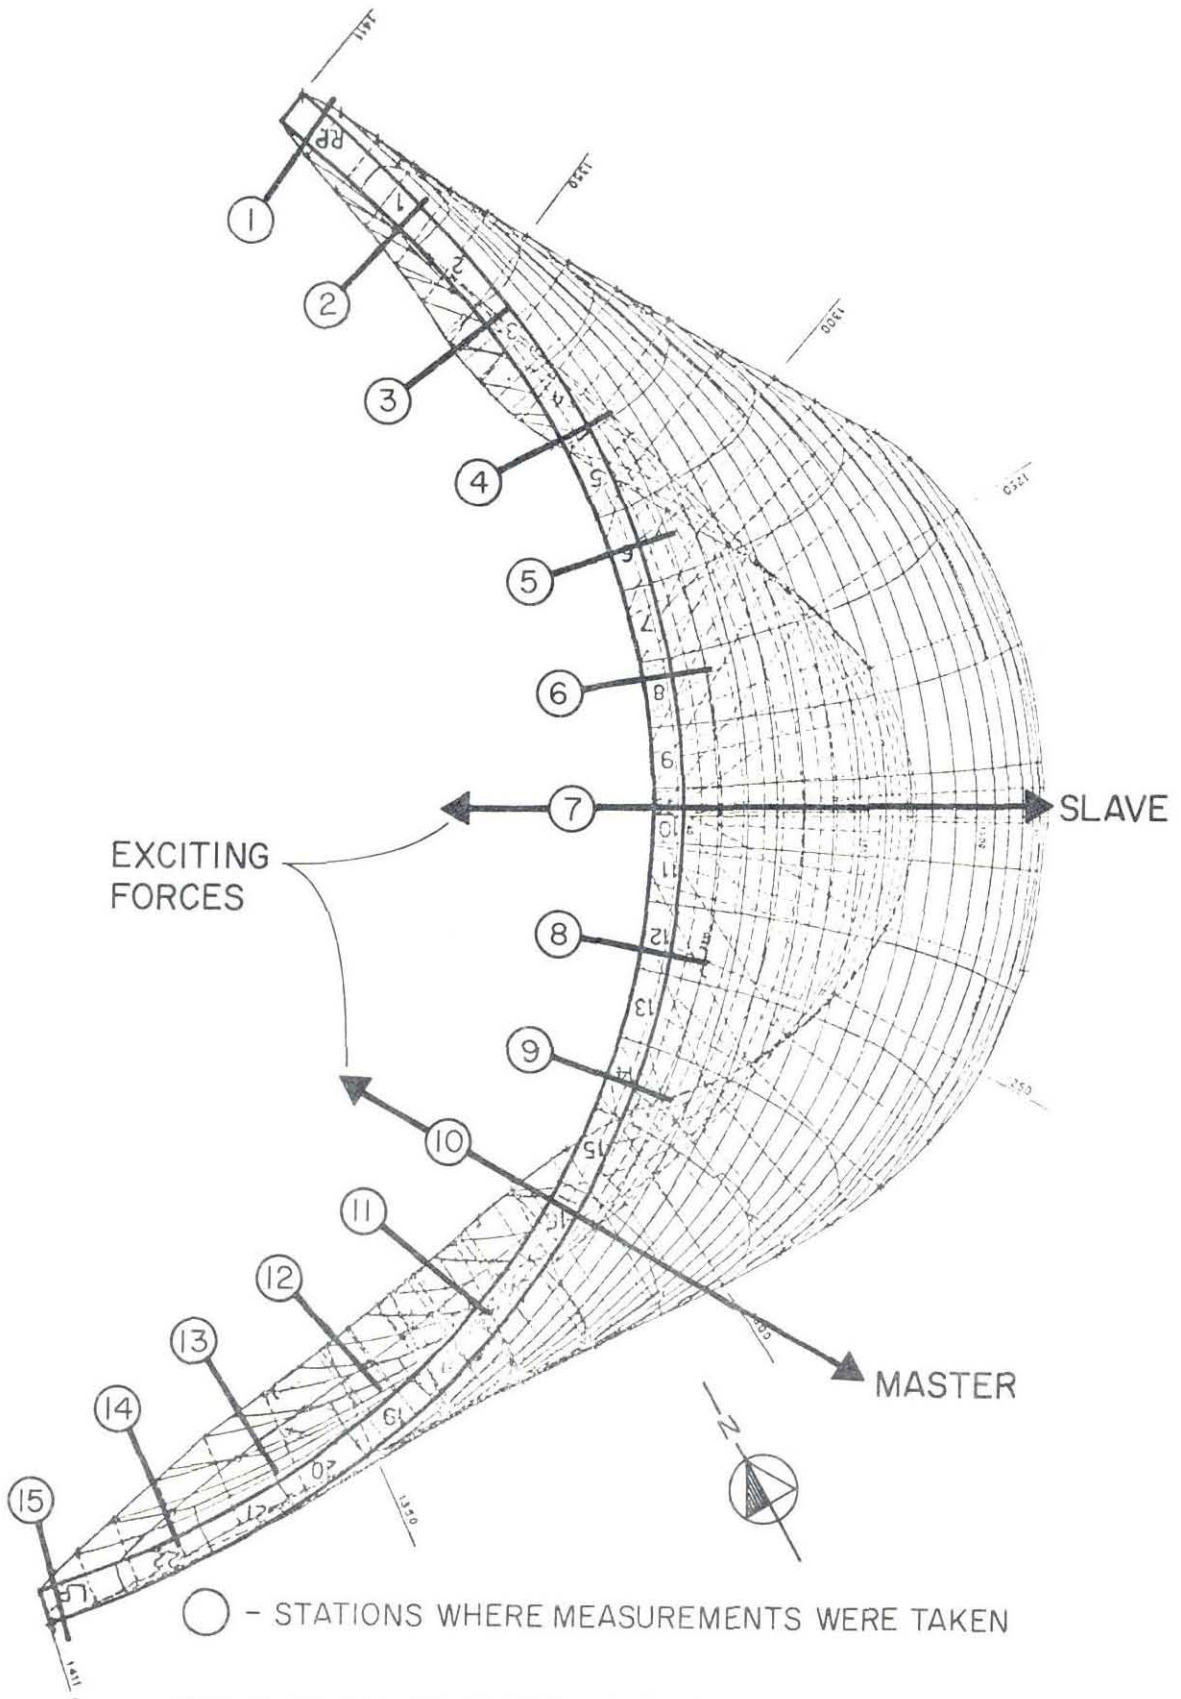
PLAN OF TECHI DAM SHOWING LOCATION OF VIBRATION GENERATORS
